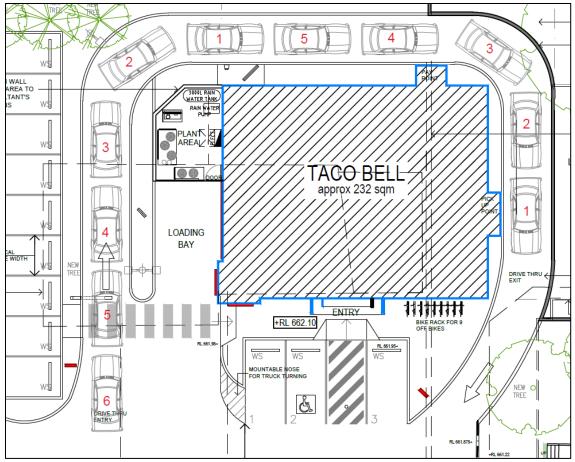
Site Plan - Queuing Capacity of Proposed Drive-through
